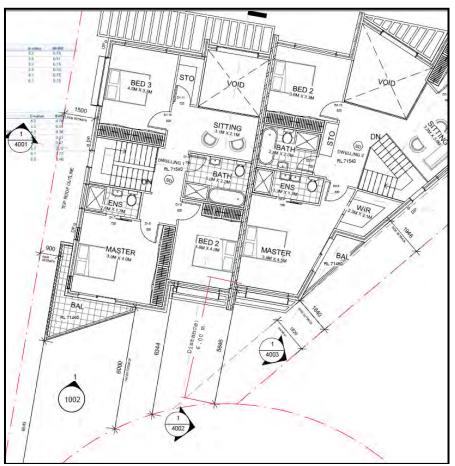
A: Plan showing first floor bedroom encroachment (6m line shown in red).
